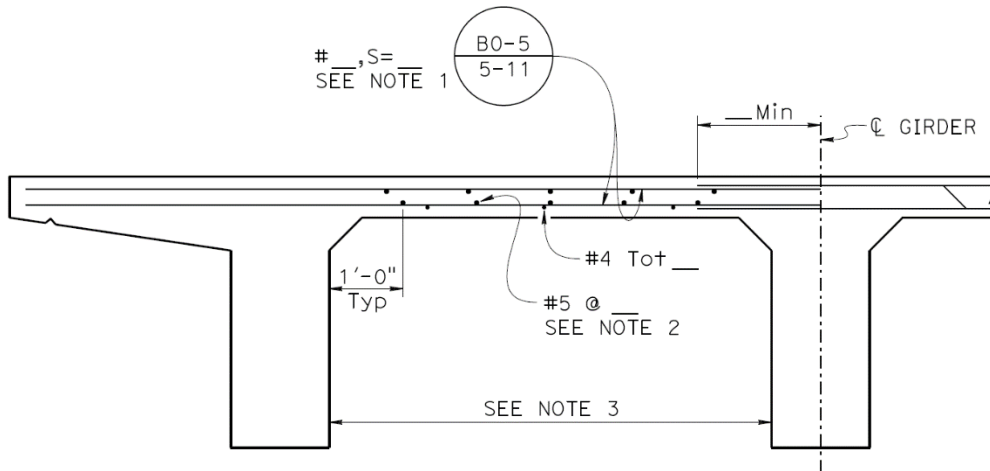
Transverse Reinforcement for Exterior Girders
